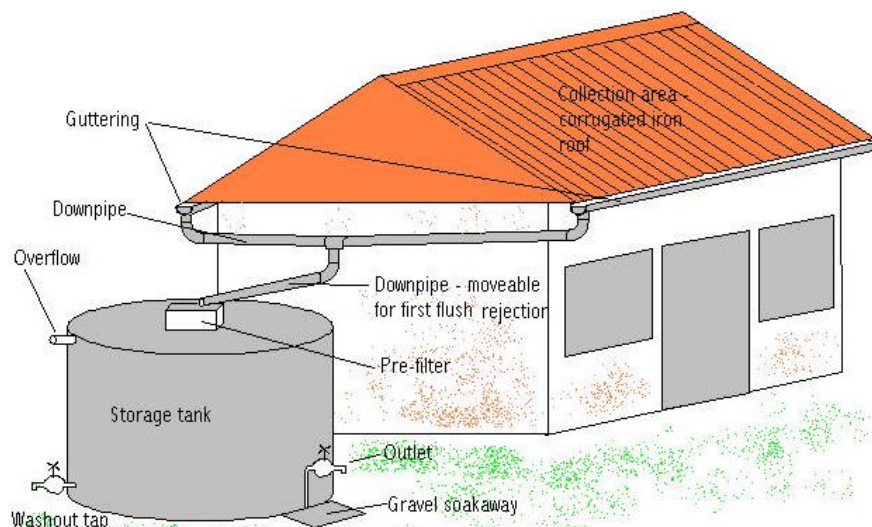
Domestic rainwater harvesting system (DTU 1998).
